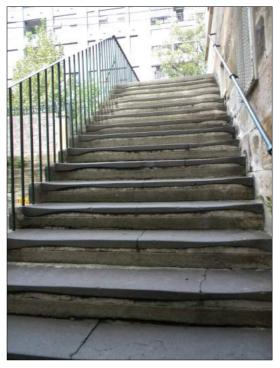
Detail of the later bridge between the above staircase and Chalmers Street. Figure 79: Detail of the stairs.
